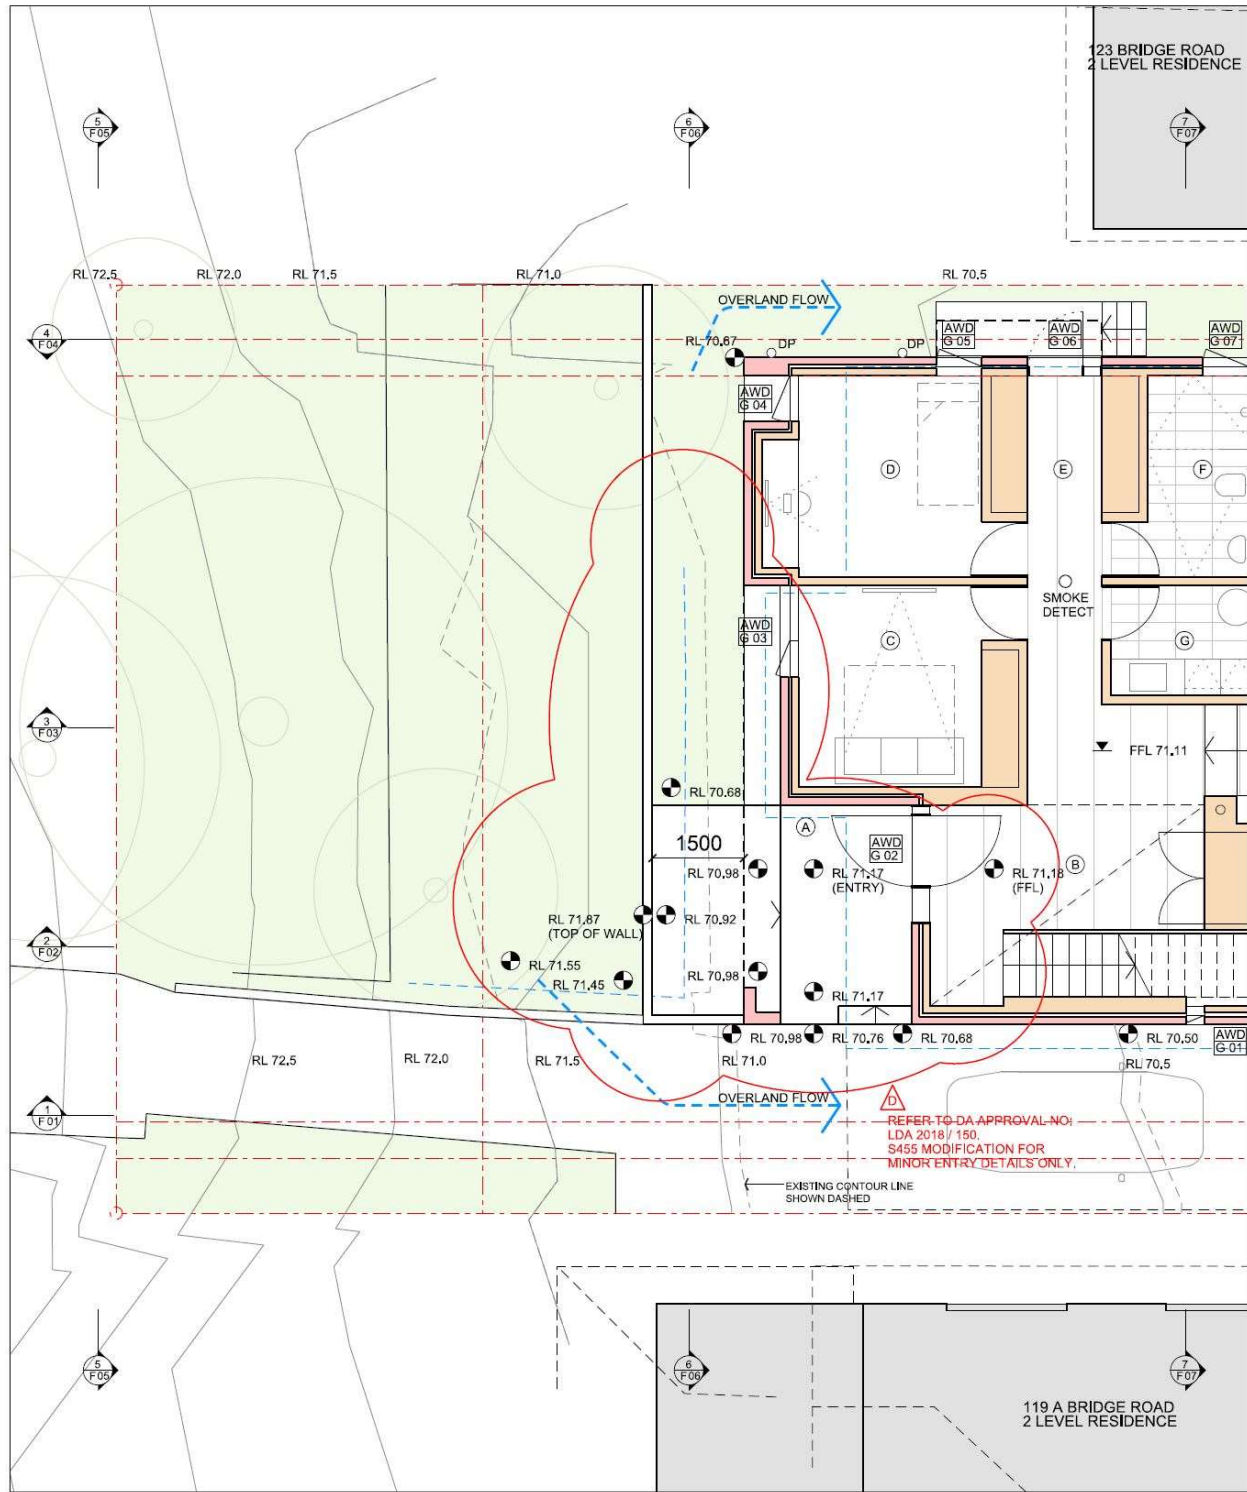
Extract of drawing N01 detailing the 'as built' entry configuration.
